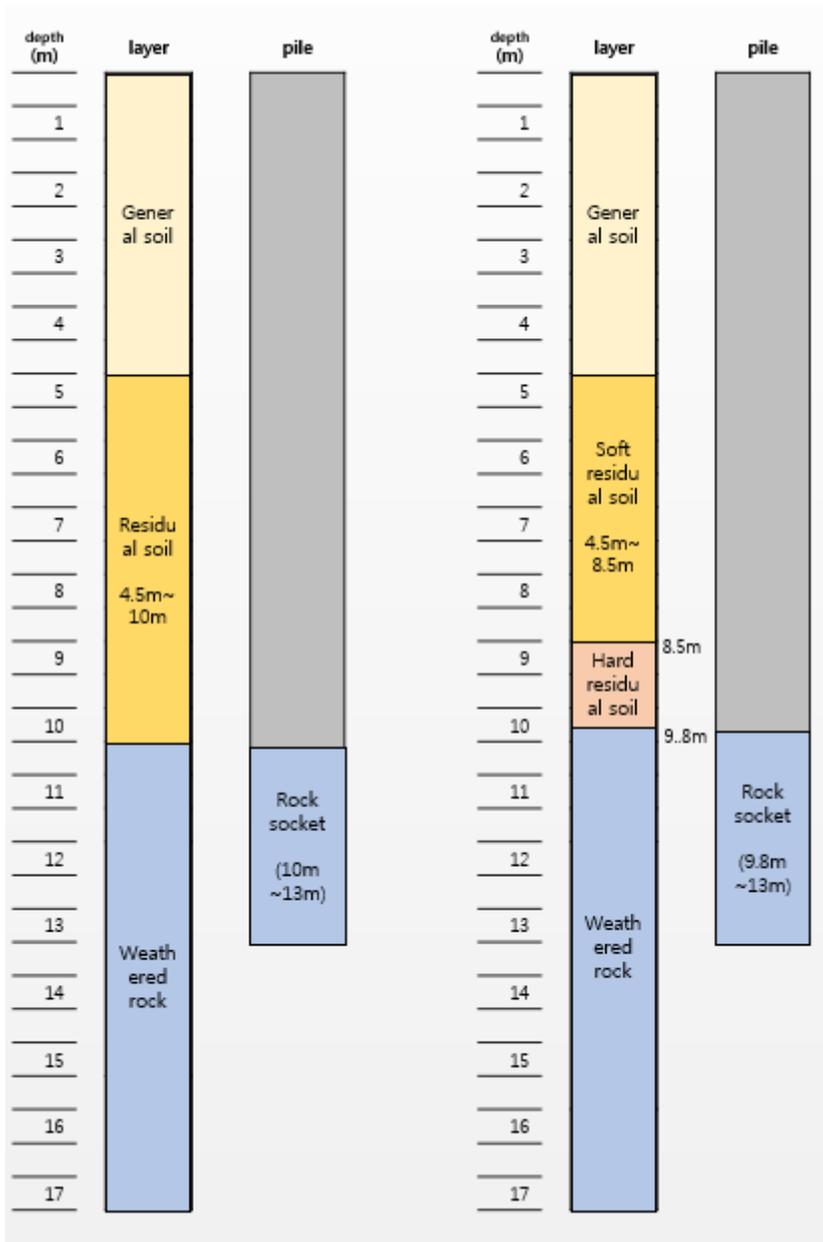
Section view of the subsurface layer for pile No. 8 before and after Modification
